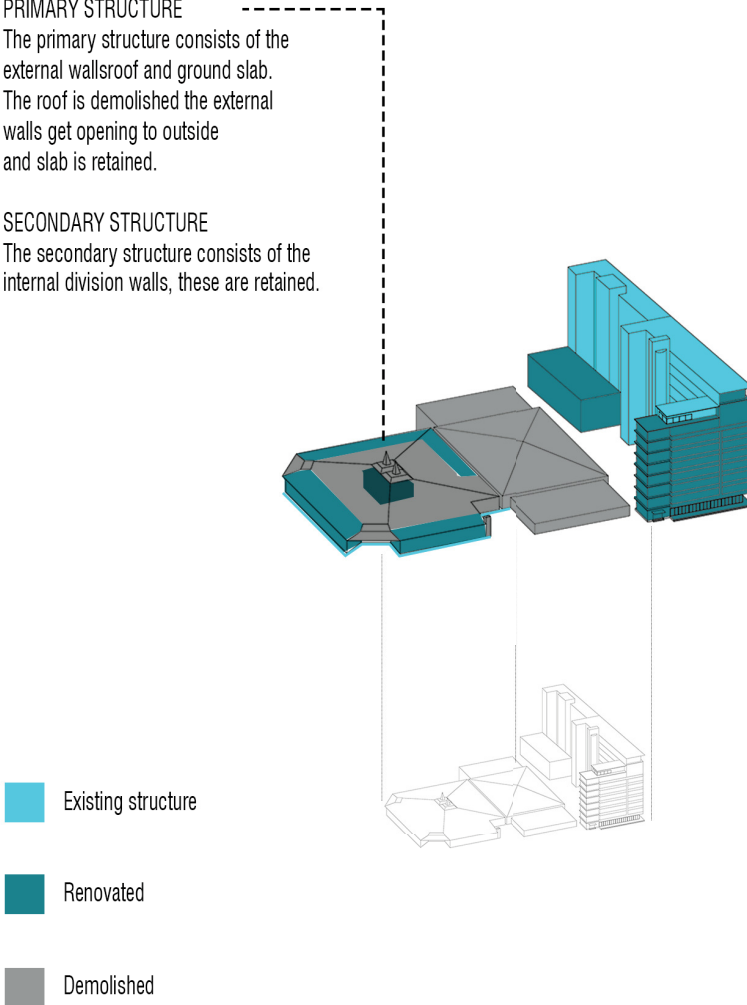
APPROACH TO EXISTING STRUCTURE
